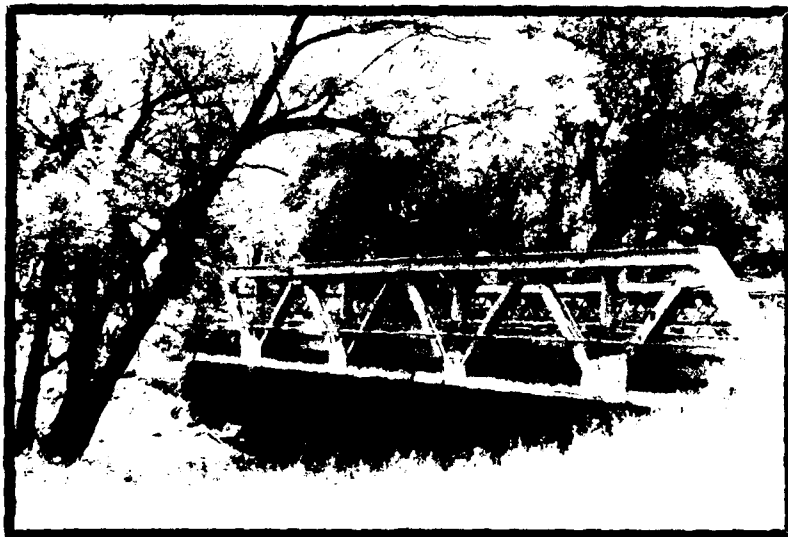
View looking downstream at Pavement Road Bridge. The bridge deck is very low with respect to the stream bed so that even moderate flooding would overflow the road.
